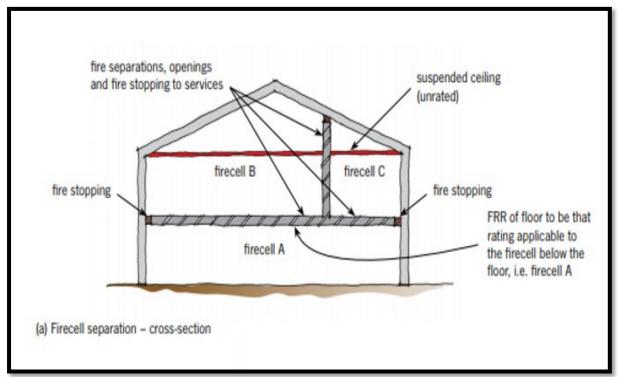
From BRANZ 'Guide to Passive Fire Protection in Buildings'
